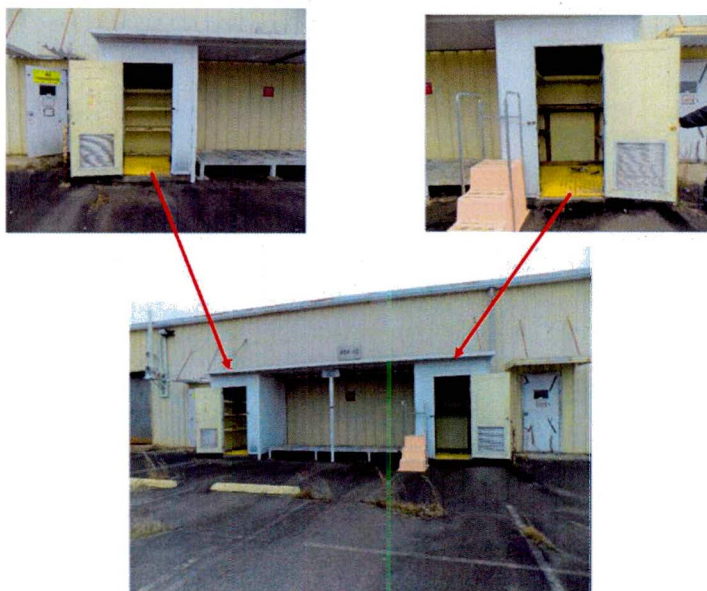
Interior and Exterior Views of 484-4D Storage Buildings
